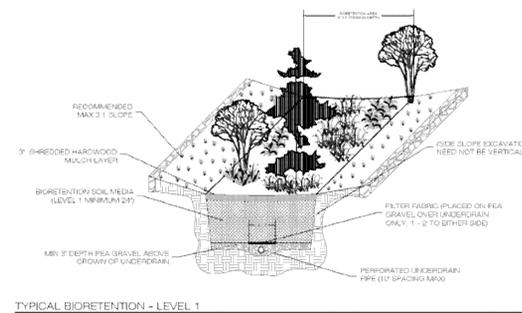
Typical Detail of Bioretention Basin Level 1 Design
